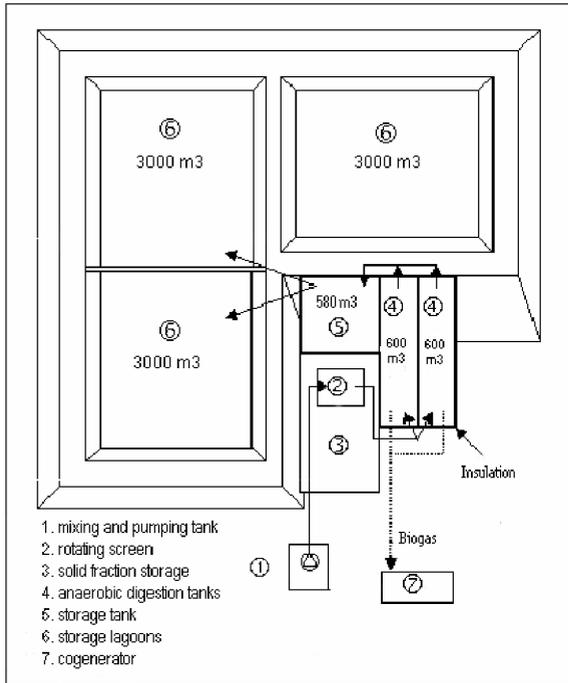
"S & B" farm: plan and flow-sheet of the biogas plant
